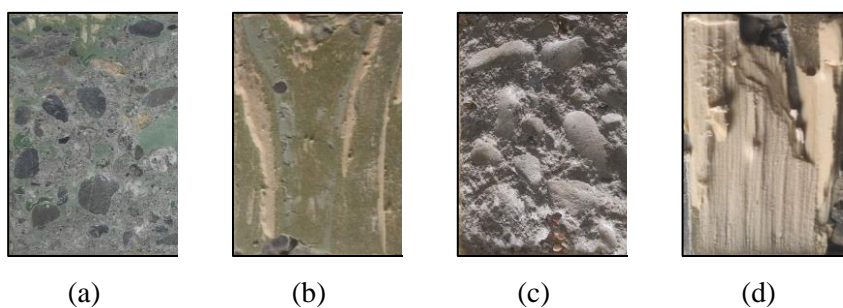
Types of failure modes of TCC specimens: (a) adhesive failure at the interface with concrete, (b) adhesive failure at the interface with wood, (c) cohesive failure in the concrete, and (d) cohesive failure in the timber
